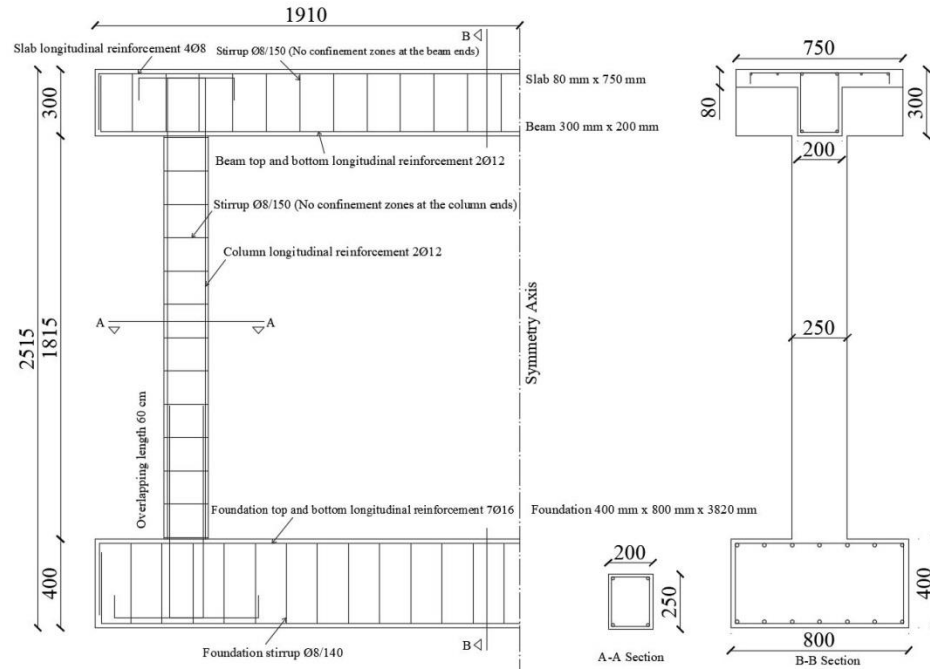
Reinforcement and geometric details of the frame (Units are in mm)
